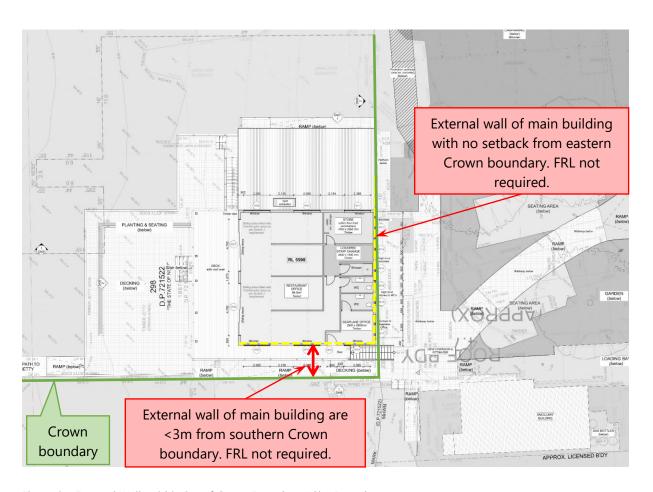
External Walls within 3m of Crown Boundary / Site Boundary
